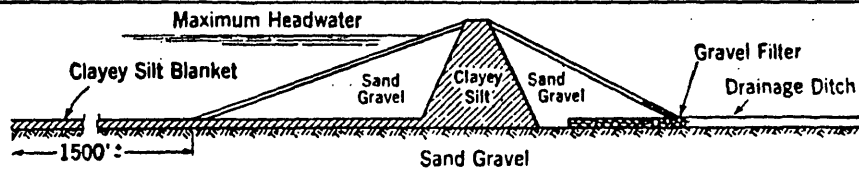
FIG. D - DESIGN FOR SITE WHERE CLAYEY SILT & COARSE SAND ARE AVAILABLE - FOUNDATION PERVIOUS TO GREAT DEPTH.
